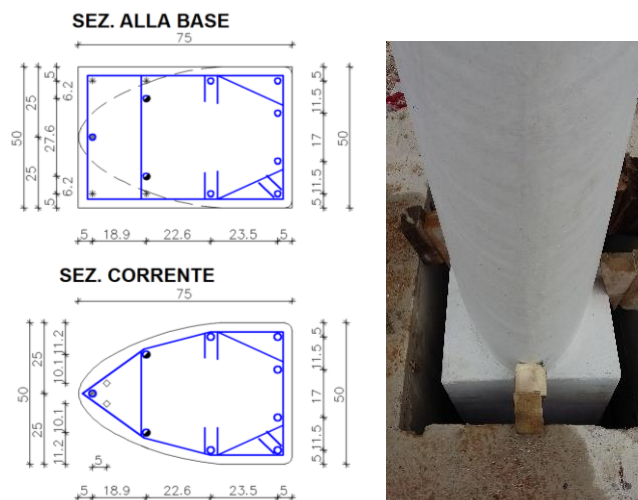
Reinforcement sketch and mounting details of ogival section pillars. / Schema di armatura e dettaglio in fase di montaggio dei pilastri a sezione ogivale.
